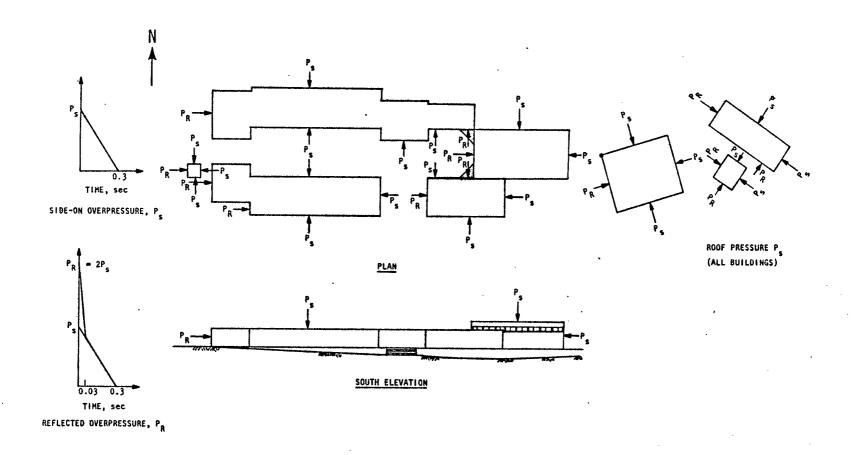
AIRBLAST LOADINGS ON SCHOOL AND ANCILLARY BUILDINGS
